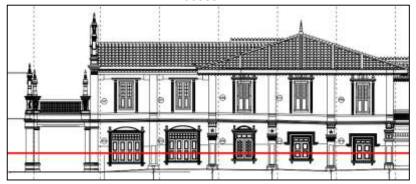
Datum Line and Left Elevation of Private Area of *Istana Bandar*.
